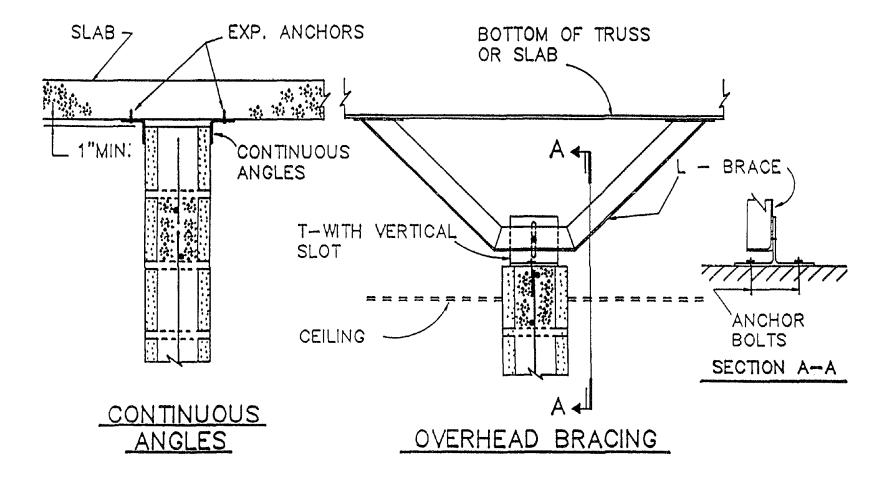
Typical Details for Bracing Masonry Partition Walls
